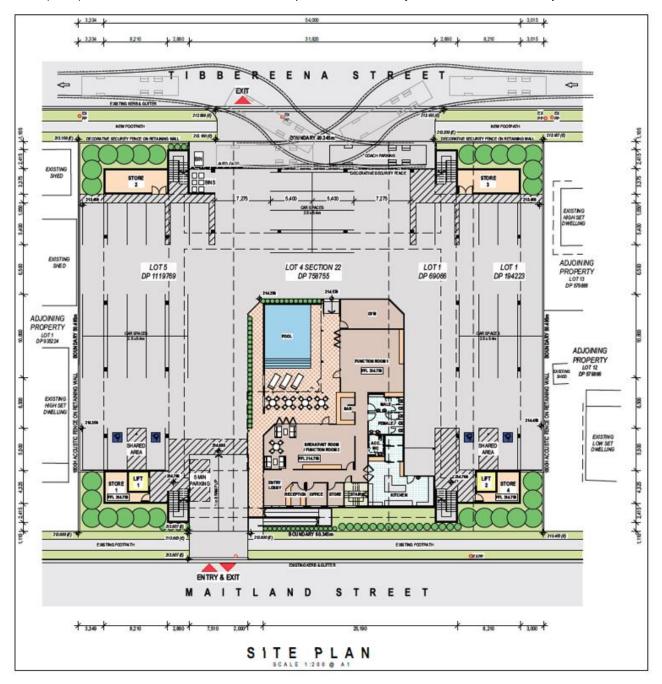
Proposed Site Plan (Hill Lockart Architects, 2021)
